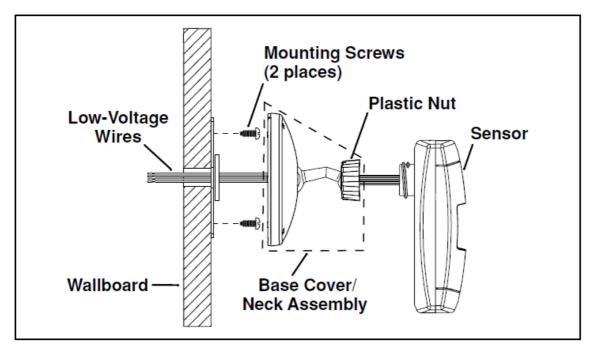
MC-W WALL MOUNT INSTALLATION
